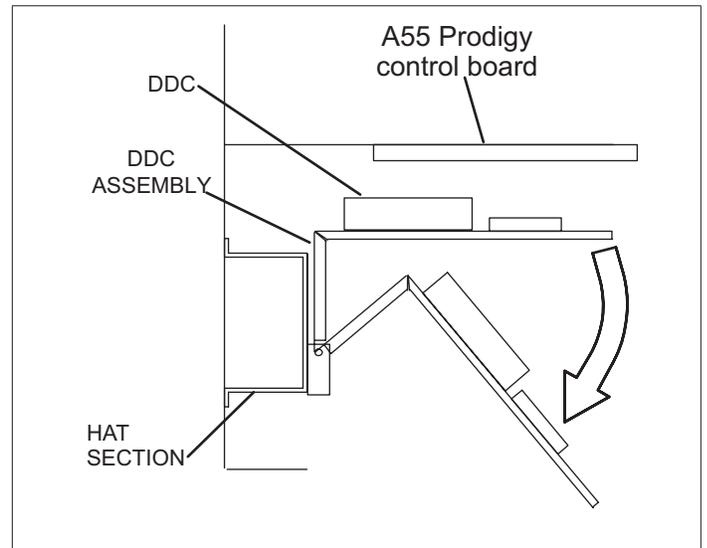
240 Units – Attaching DDC Hinged Mounting Panel to Hat Section
